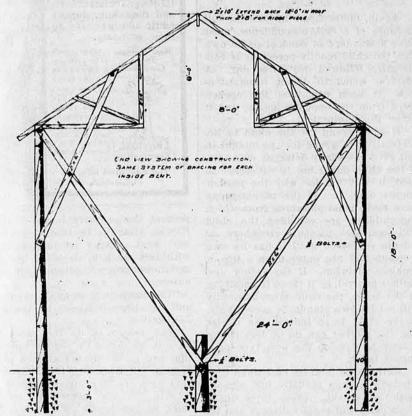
Showing plan of construction of end section, general plan of brac-ing for middle sections.
